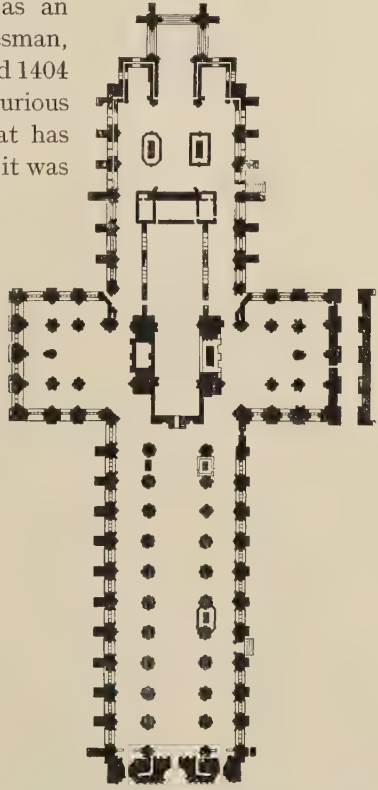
PLAN OF WINCHESTER CATHEDRAL
